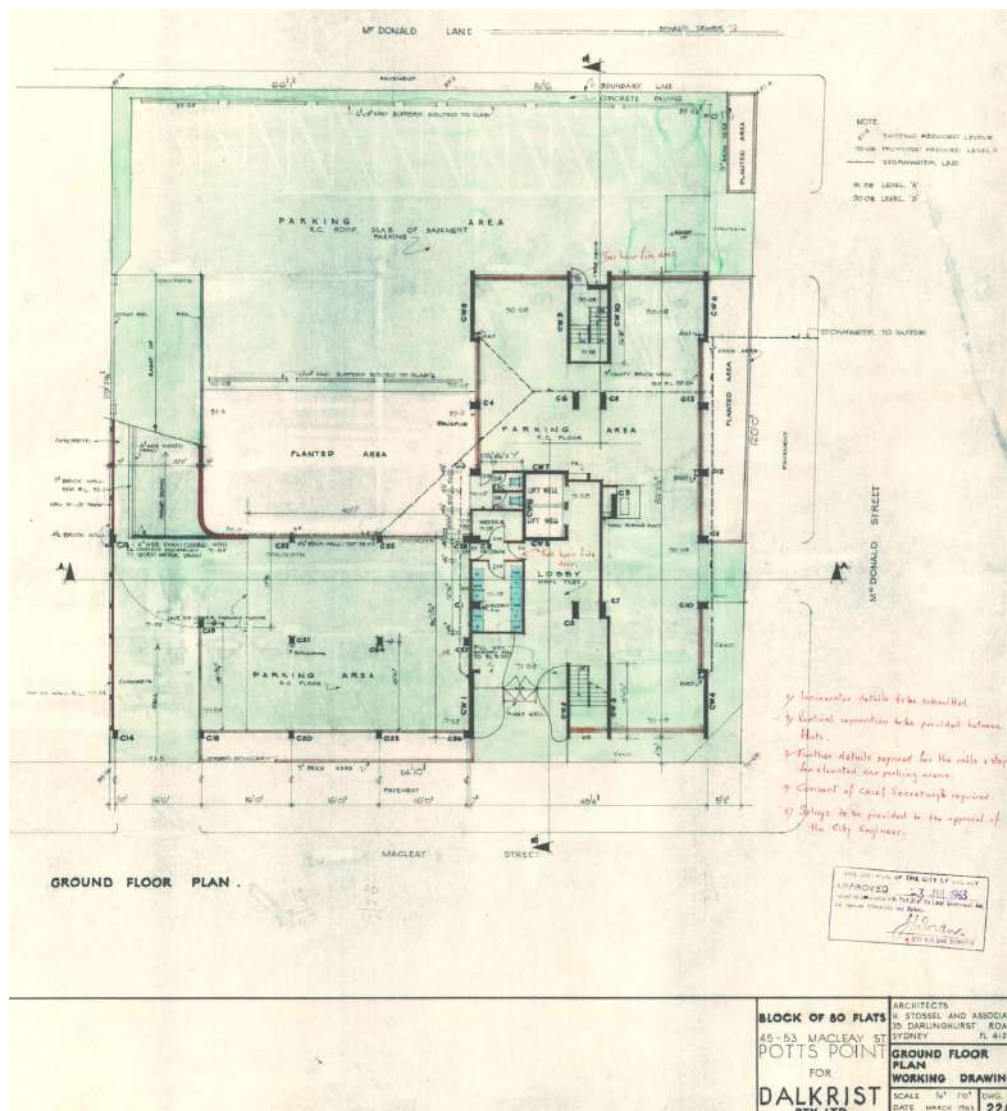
Plan of the ground floor of the implemented design of March 1963 designed by Hugo Stossel for Dalkrist Pty Ltd.
